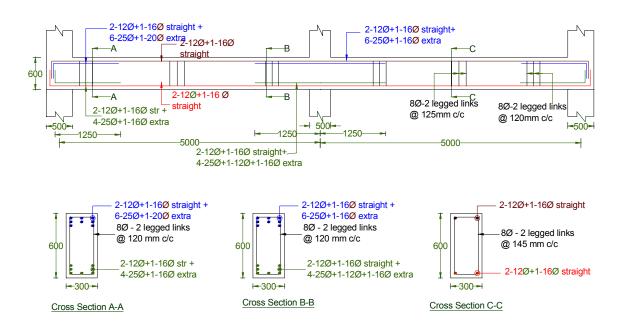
Reinforcement details for the beam ABC as per IS 456:2000 (with R=3)
